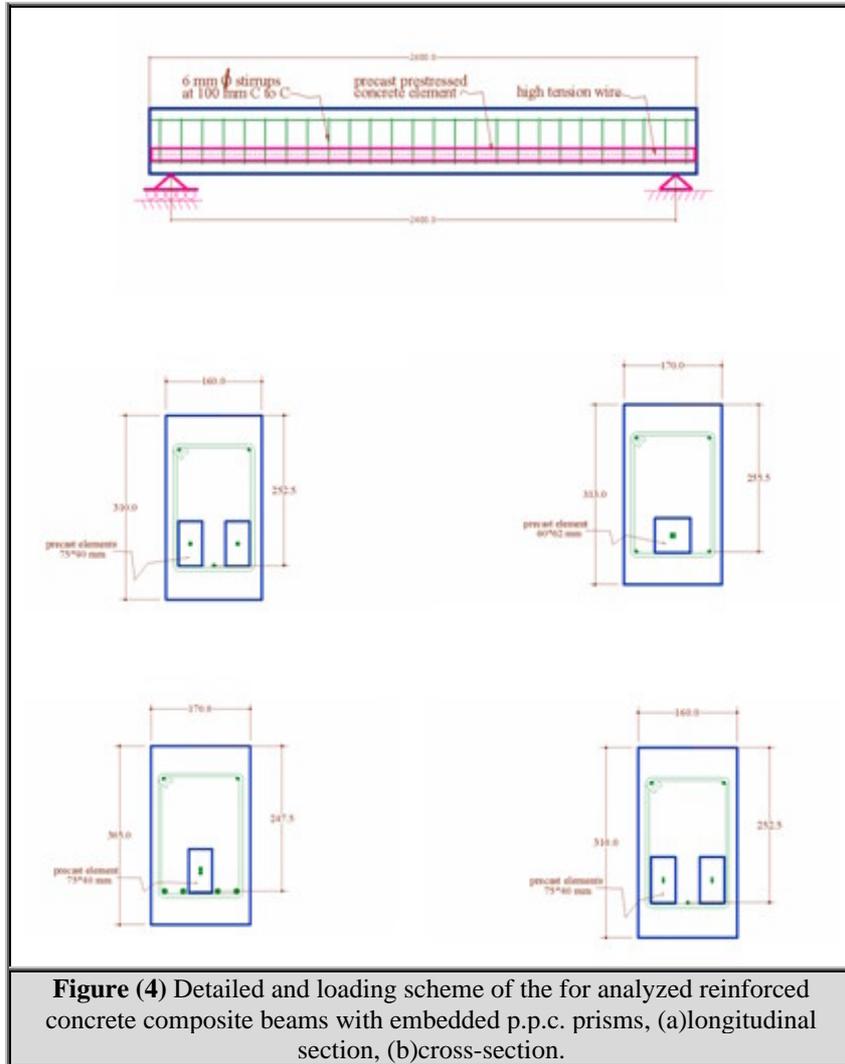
Detailed and loading scheme of the for analyzed reinforced concrete composite beams with embedded p.p.c. prisms, (a)longitudinal section, (b)cross-section.
